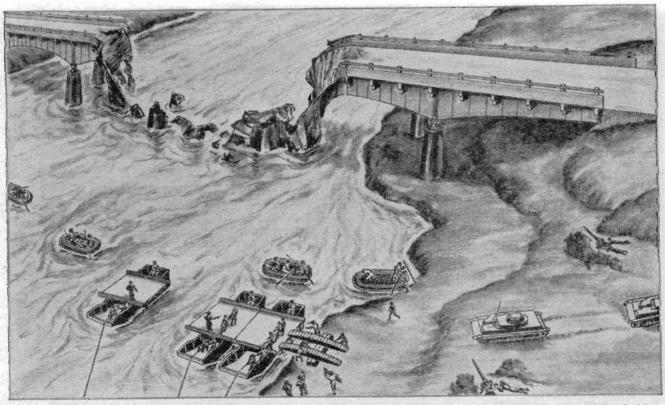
Demolition should be of such extent that it will take the enemy longer to repair the bridge than to construct a new temporary bridge or ford.
